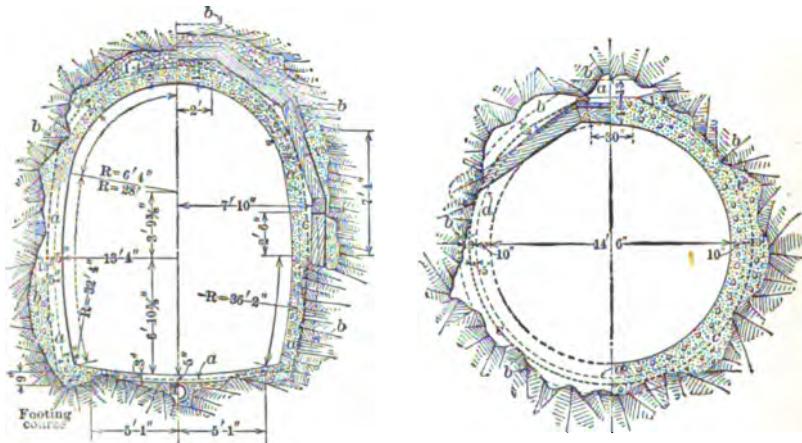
Cross-sections of typical tunnels, Catskill Aqueduct.
